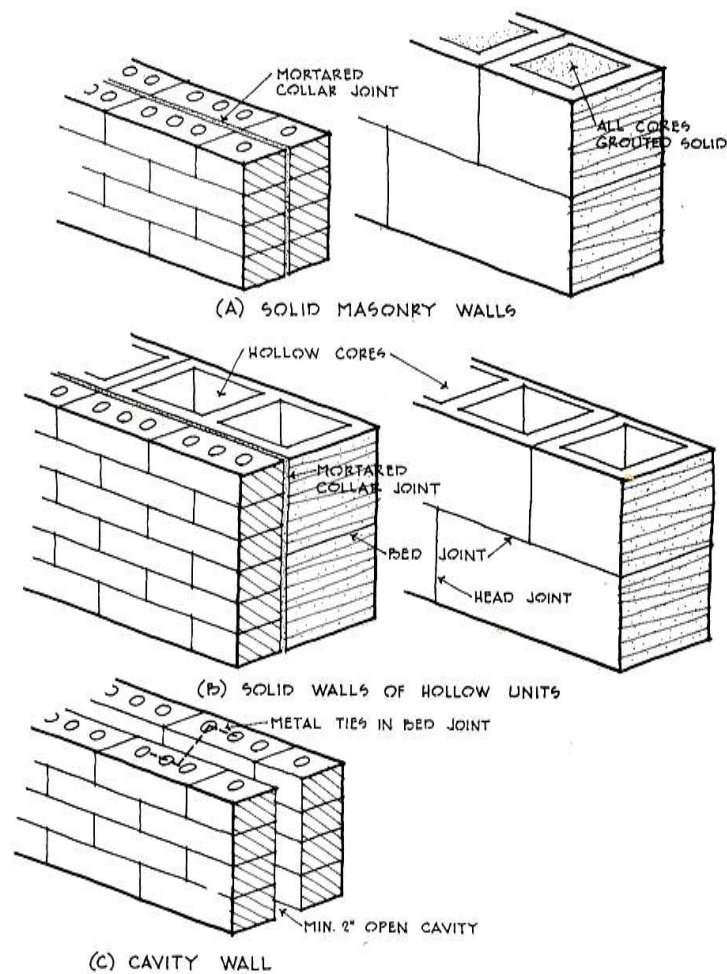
Modern masonry wall types and nomination (Beall, 1987: 7)
